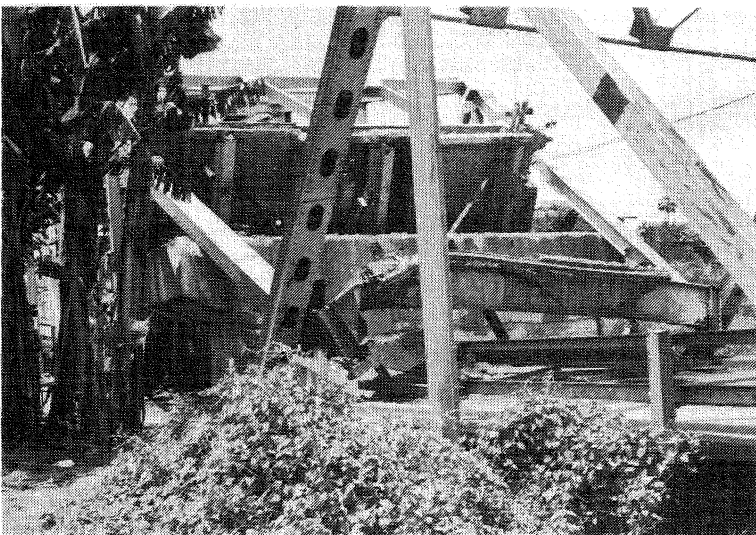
Carmen Bridge; pier between spans 12 and 13. Pier has broken up through bottom chord and deck of span 13 which has folded up - view towards the southwest
